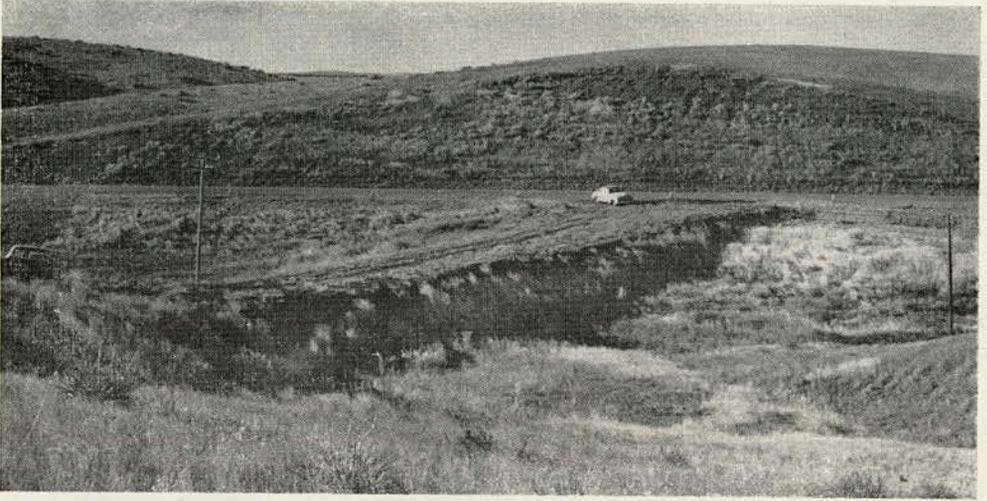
Earth buttress fill to prevent sliding. Earthfill constructed as buttress between highway embankment and opposite stable valley wall; culvert placed in creek channel under buttress. This particular installation (4 miles west of Pierre, S. Dak.) was for slide correction, but similar buttress fills are frequently constructed for prevention of slides. The horizontally bedded soft shale on far hill was moving down slowly and causing displacement of the highway fill toward the observer. (Photograph by D. J. Varnes, U. S. Geological Survey)
